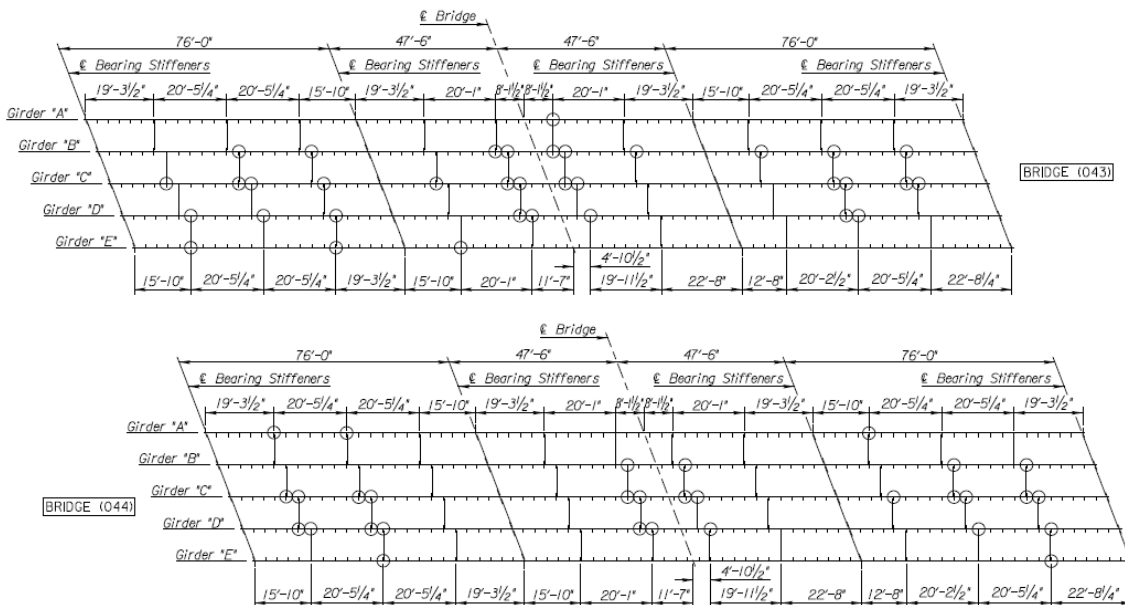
Plan of Kansas Bridge 135-87(043/044); circled areas indicate locations where cracks have been reported.
